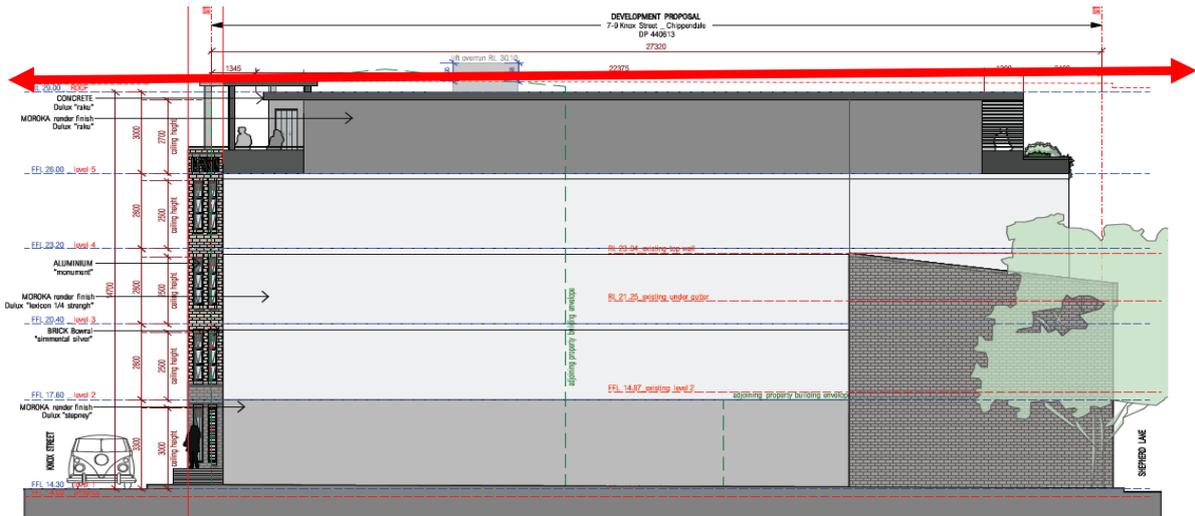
Originally proposed west elevation with the 15m height limit plane indicated by the red arrow
